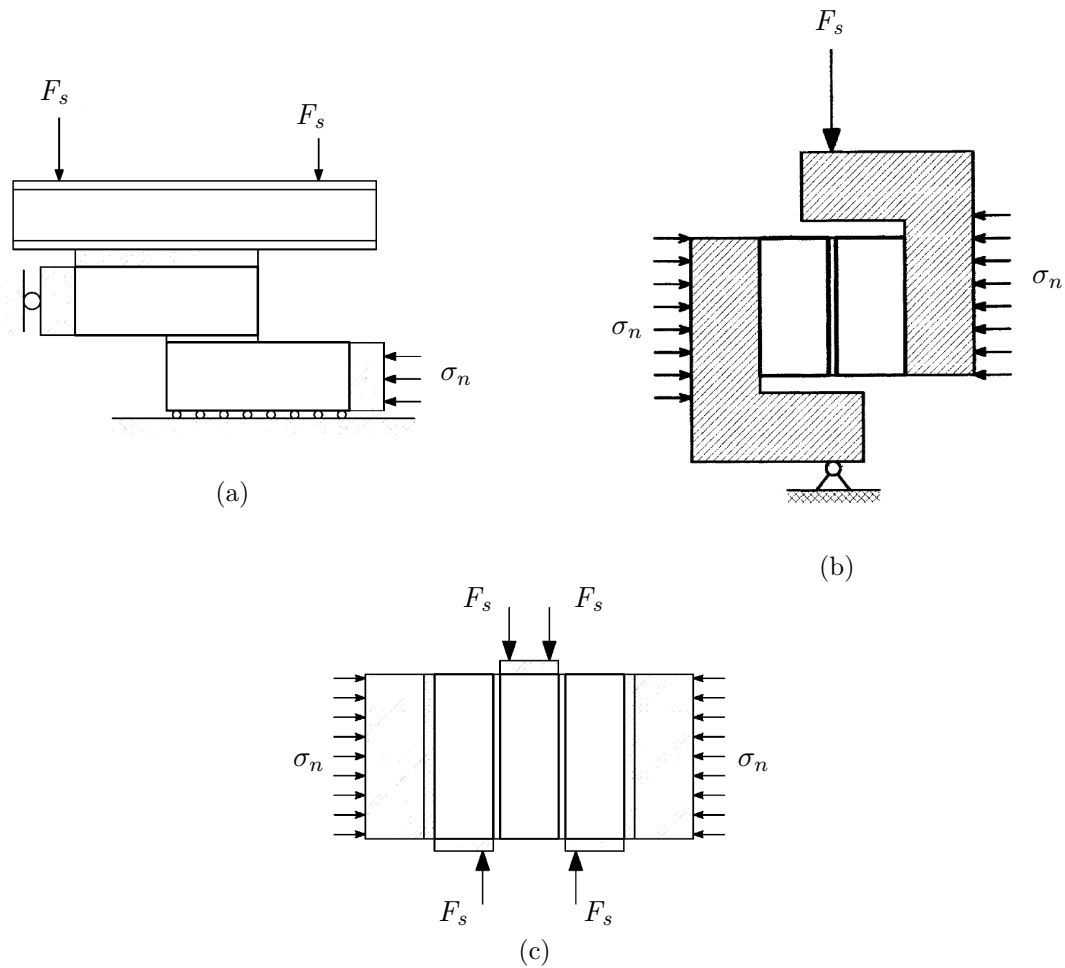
Horizontal masonry joint shear test methods: a) the couplet test, b) van der Pluijm test and c) triplet test.
